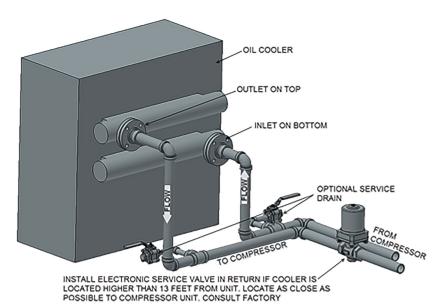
Compressor Oil Line piping to Air-Cooled Oil Cooler
